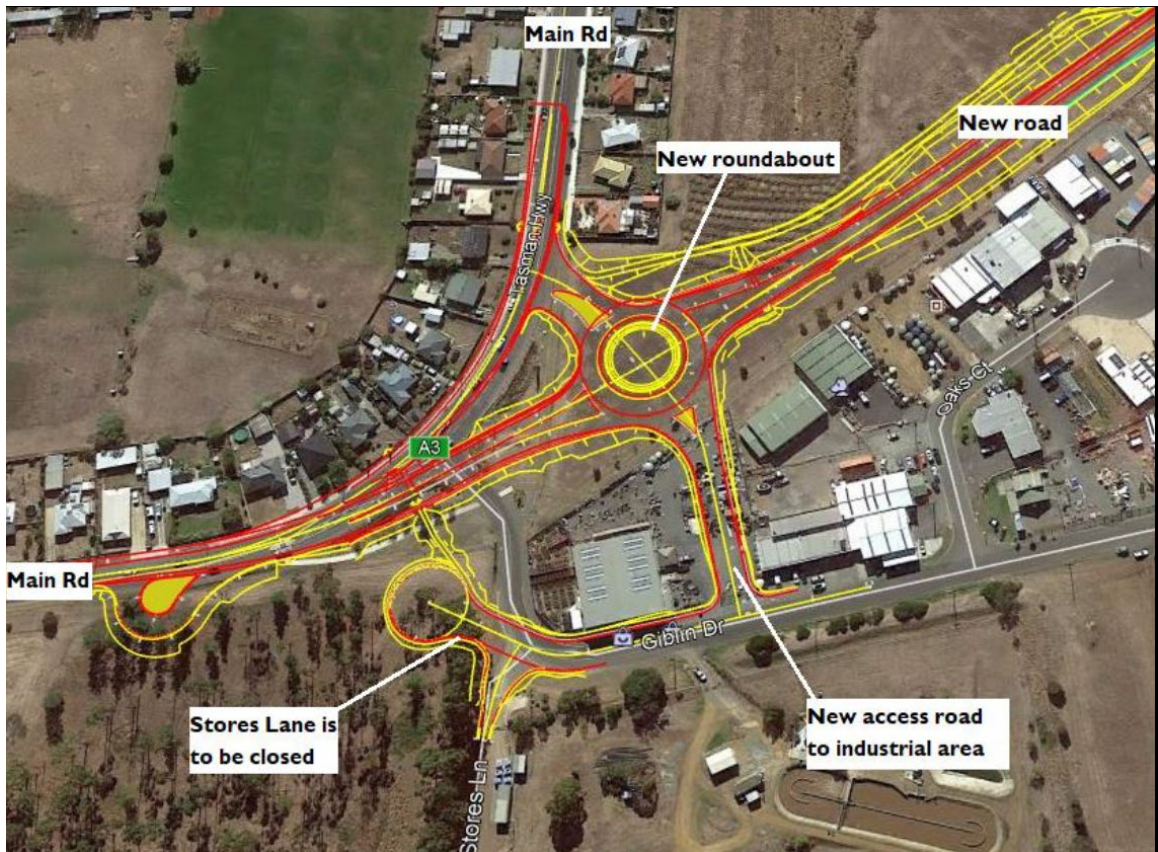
Proposed works at south-west end of bypass includes the closure of Stores Lane, a new roundabout and access road off the roundabout to industrial area, shared path, and a cul-de-sac turning area at the end of Giblin Drive. (Source: planning application documentation)
